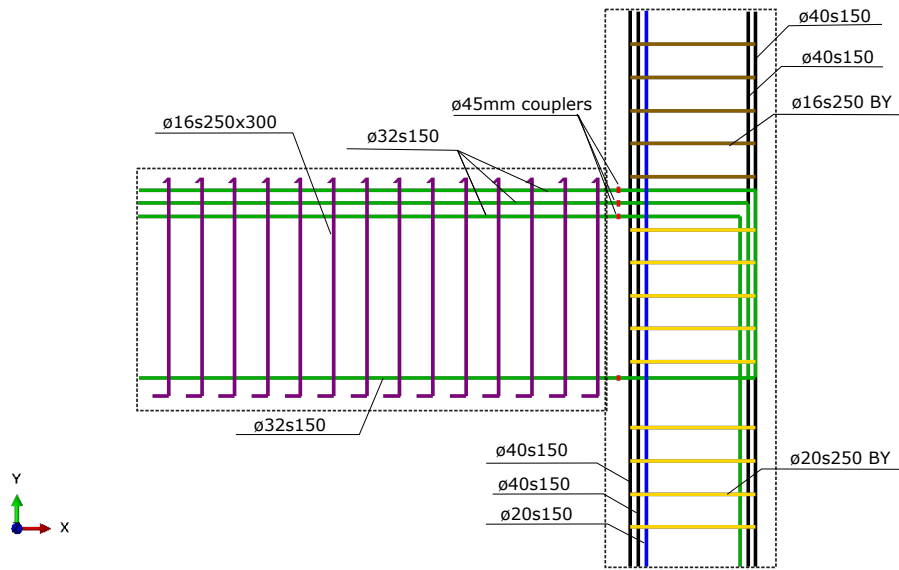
Reinforcement layout of the rigid connection, redrawn from COWI 2021
